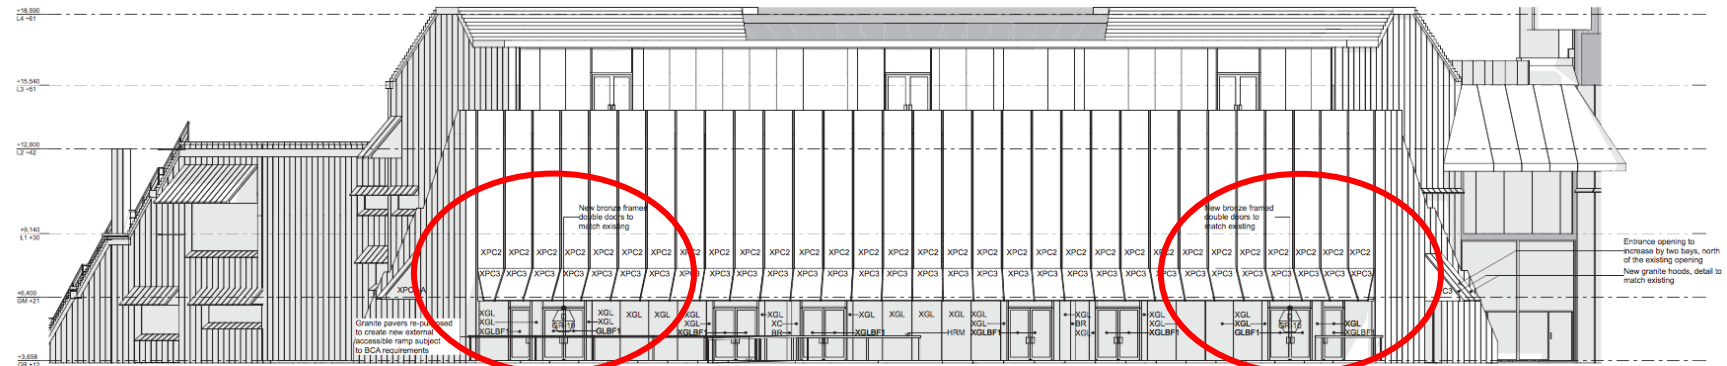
Proposed northern elevation with new bronze framed doors to match existing details in RED (Source: TZG)
